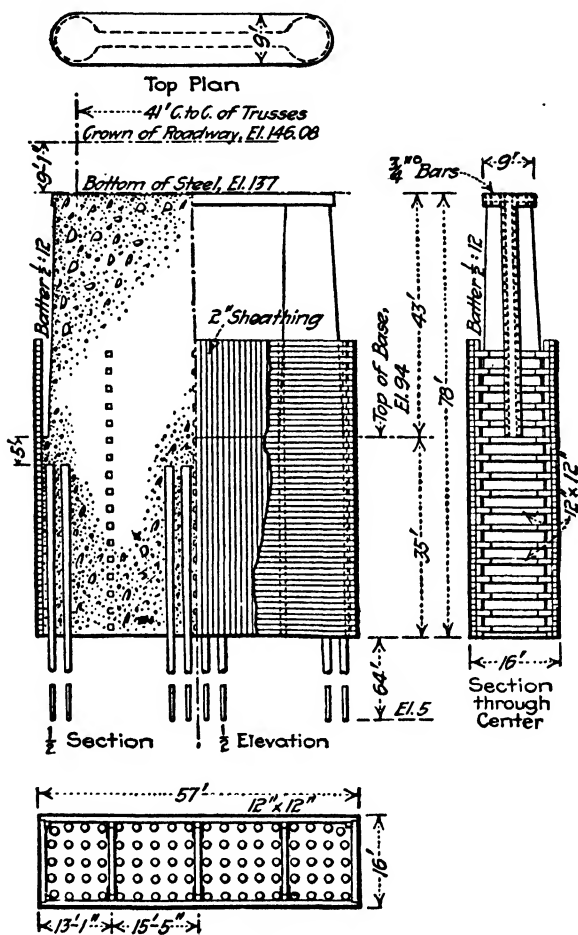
Timber Caisson of Interstate Bridge across Columbia River Ore.
